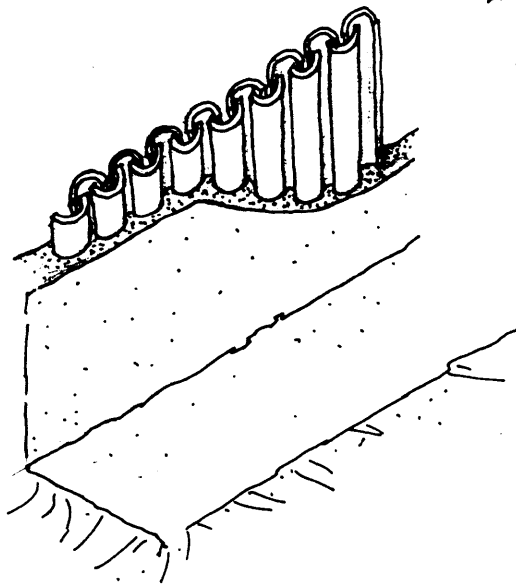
"Ekra" wall construction in Syhlet, a type of wattle and daub.
